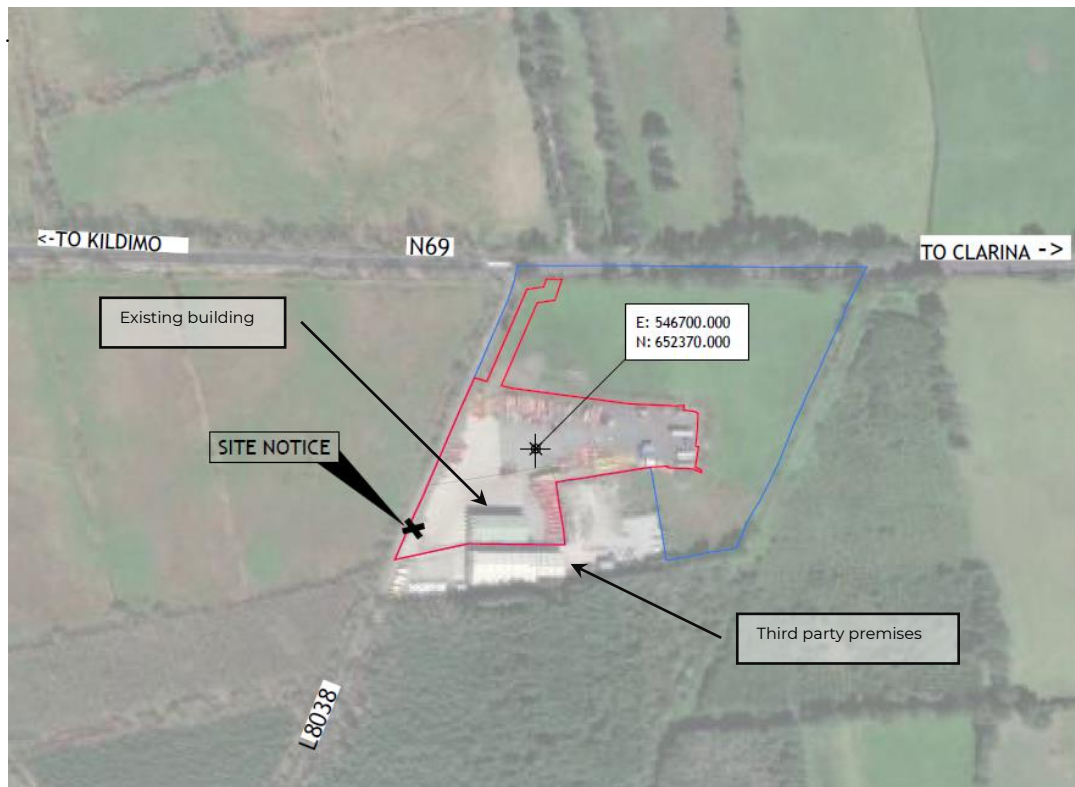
General site configuration and planning application site boundary showing site outlined in red. Extract from submitted ‘Site Location Map’ drawing.
